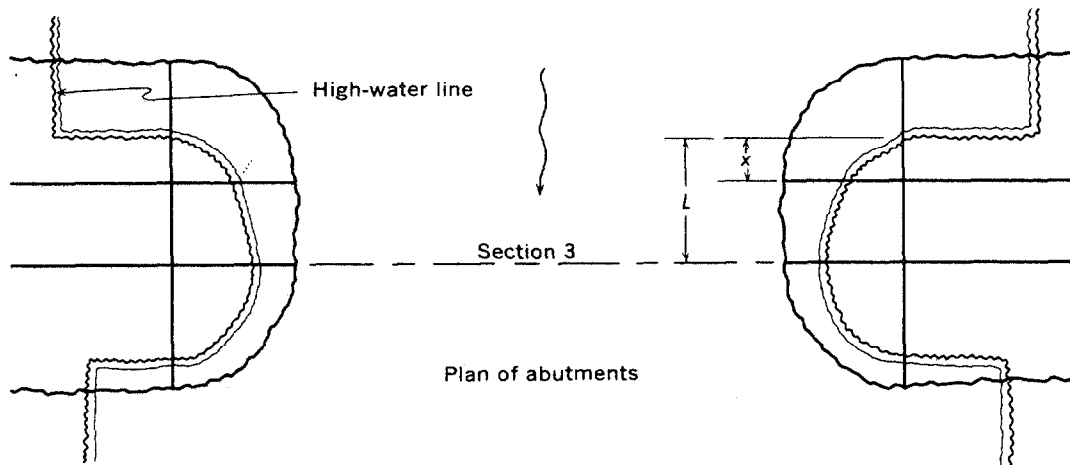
Definition sketch of type 3 opening, sloping embankments and sloping abutments (spillthrough) (after Matthai).
